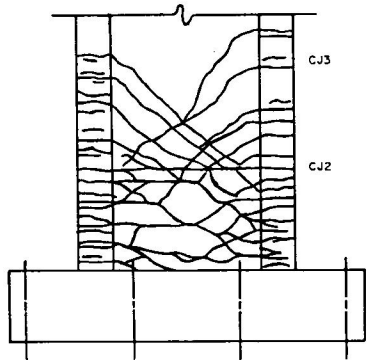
(a) Wall Subjected to Low Nominal Shear Stress
